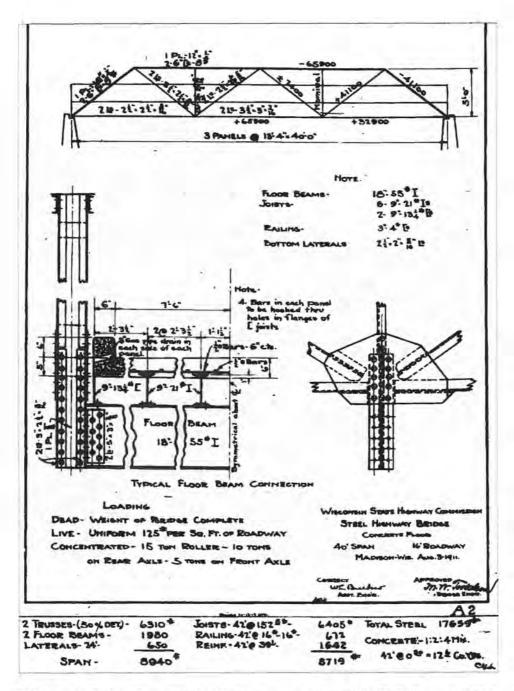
SHC standard plan for riveted, Warren, pony truss with 40-foot span, 1911. (Source: WisDOT).
